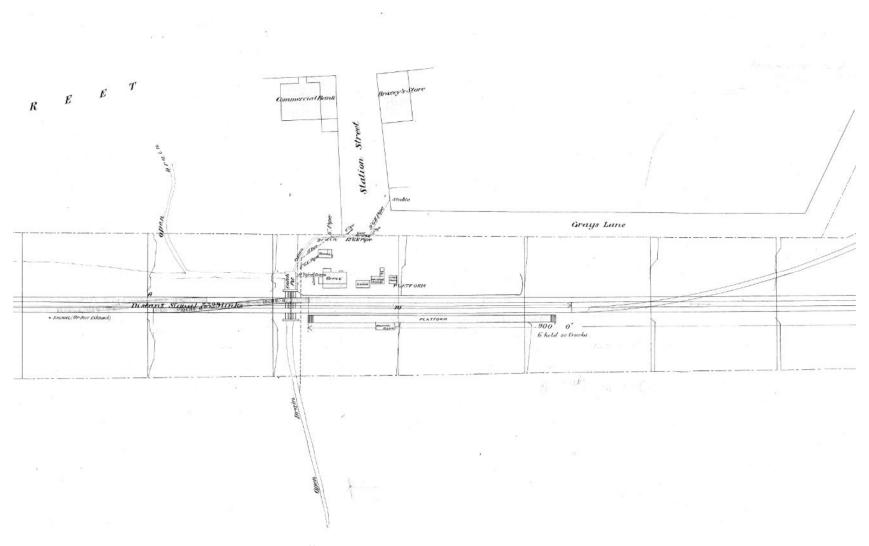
Detail of first Lithgow Station in 1892¹³. Plan orientated south.
